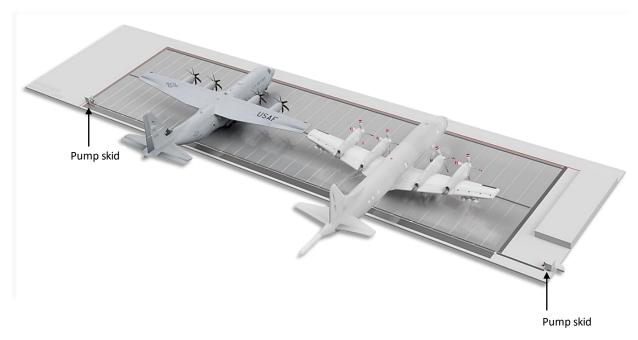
Render of ILDFA Layout with pump skids on opposite sides of the system
